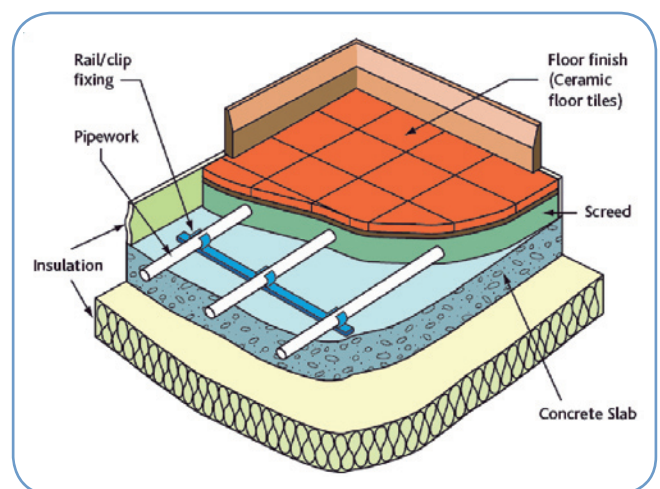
A tiled floor will allow a concrete floor slab's thermal mass to be fully exploited and is also suited to underfloor heating.
